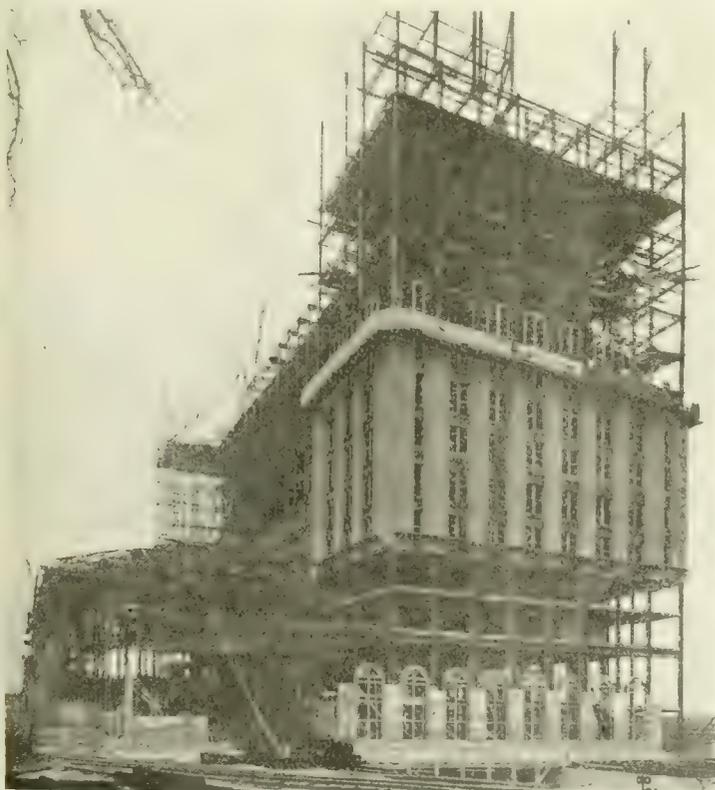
View Looking East of Detroit Station and Office Building Showing Erection Procedure—Steelwork for Waiting Room Shown at Left.
